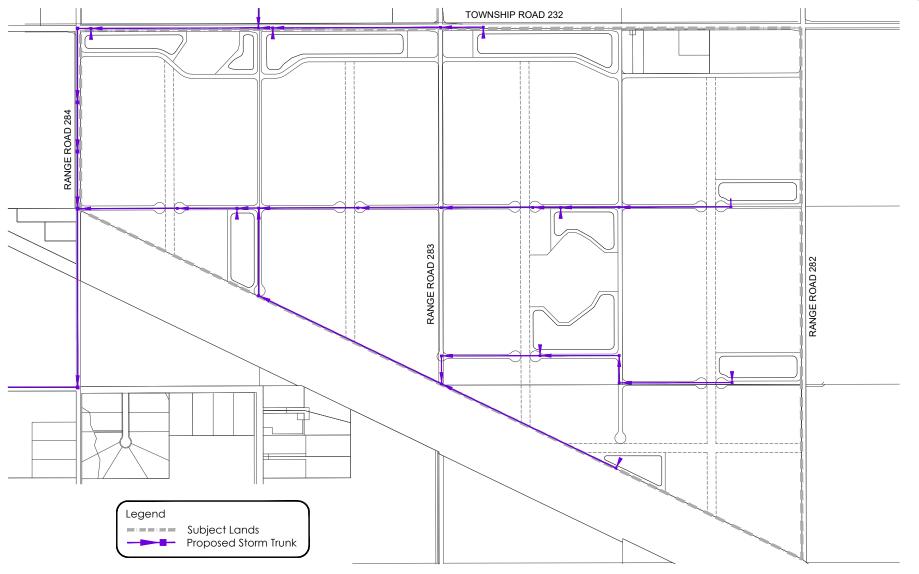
Stormwater Servicing Network TOWNSHIP ROAD 232 RANGE ROAD 284 RANGE ROAD 283 Legend Subject Lands
